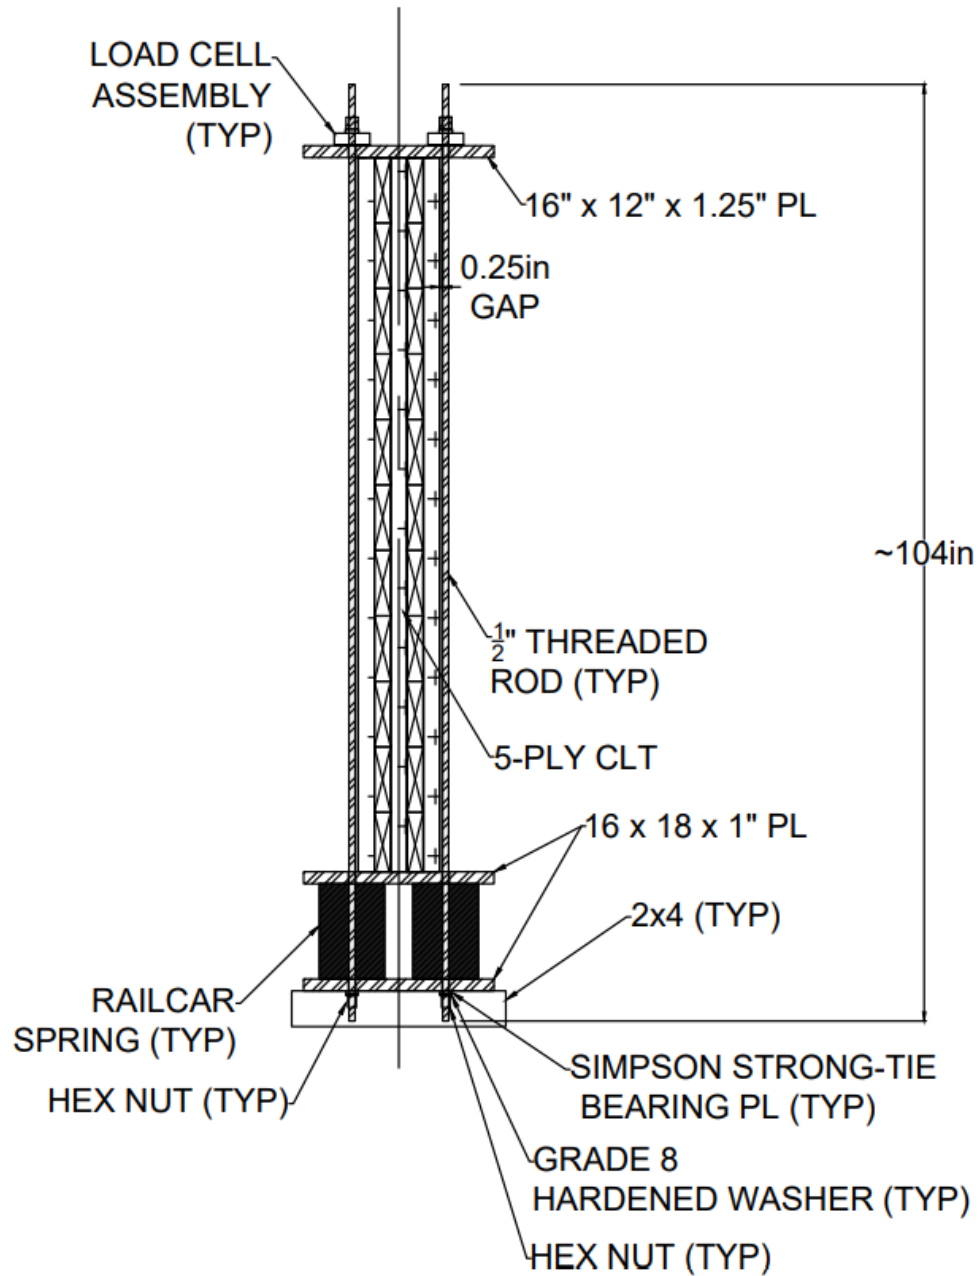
Section view of the small-scale CLT specimen design (credit: E. Baas)
